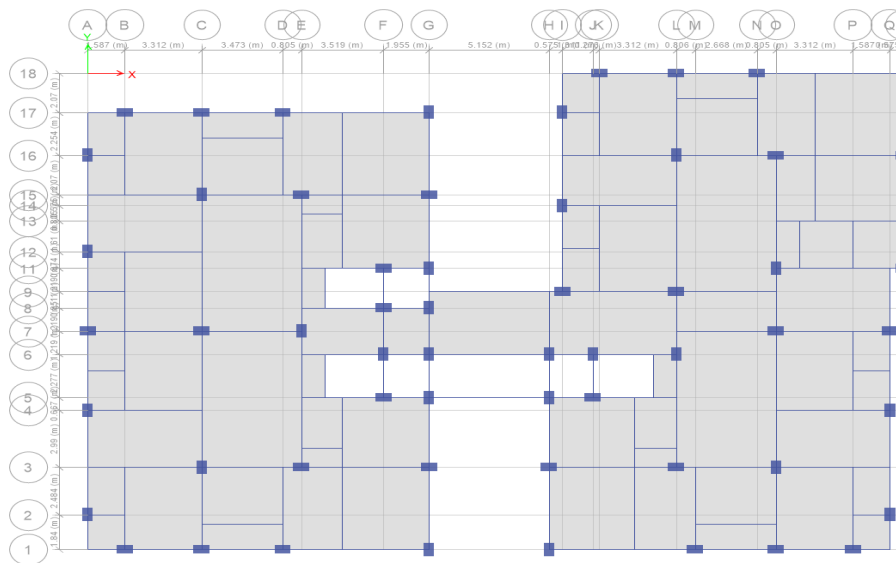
Building plan (Source: Vaibhav Keshari [1])
